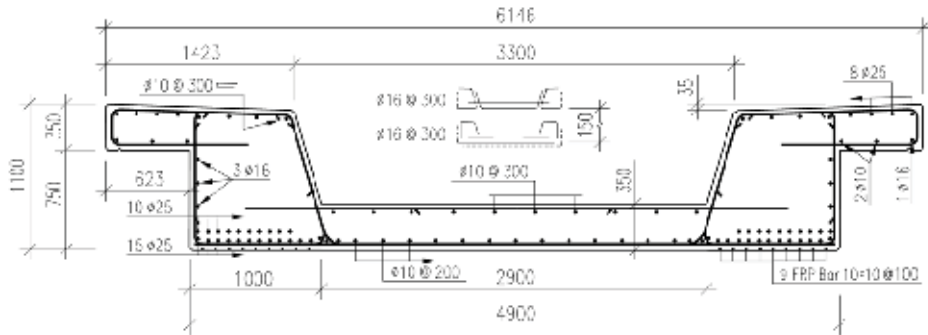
Cross-section, showing dimensions and reinforcement according to construction drawings from 1954 and the strengthening with NSM CFRP applied before the final test to failure.
